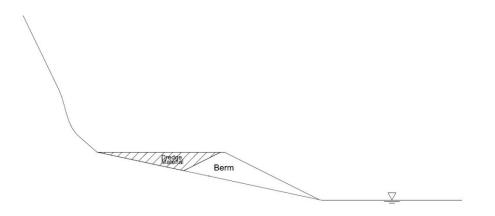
Cross Section: Concept of Kelly Bar Site
